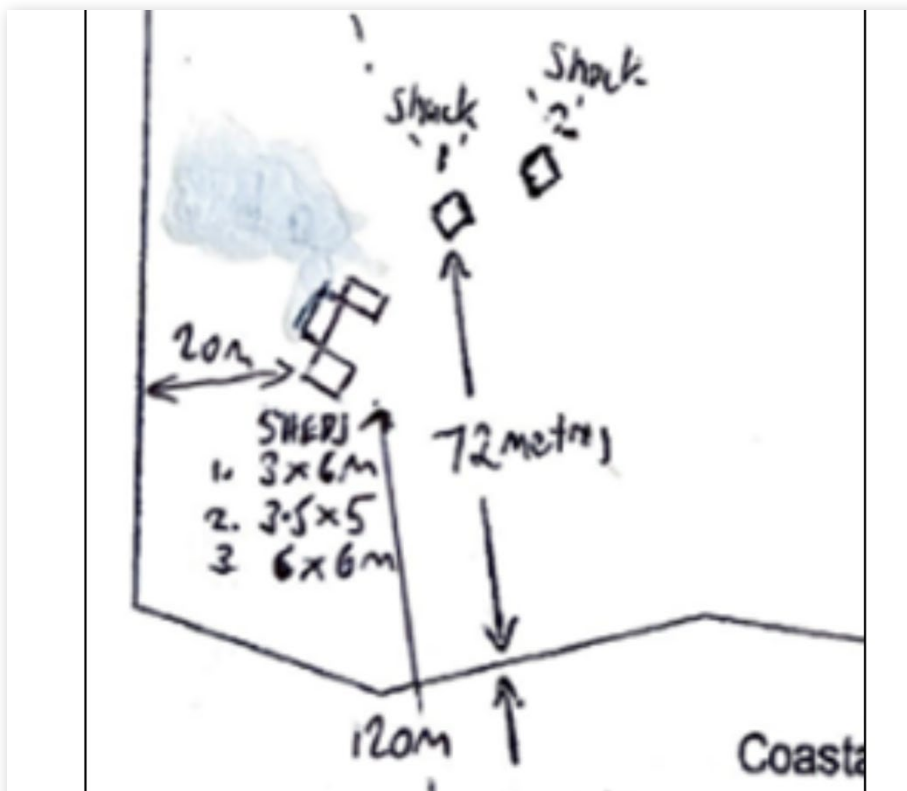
Applicant reveals the intention to construct three buildings in a similar location to the approved shed. The three buildings shown in the figure are not approved by the original permit or any other minor amendment.
